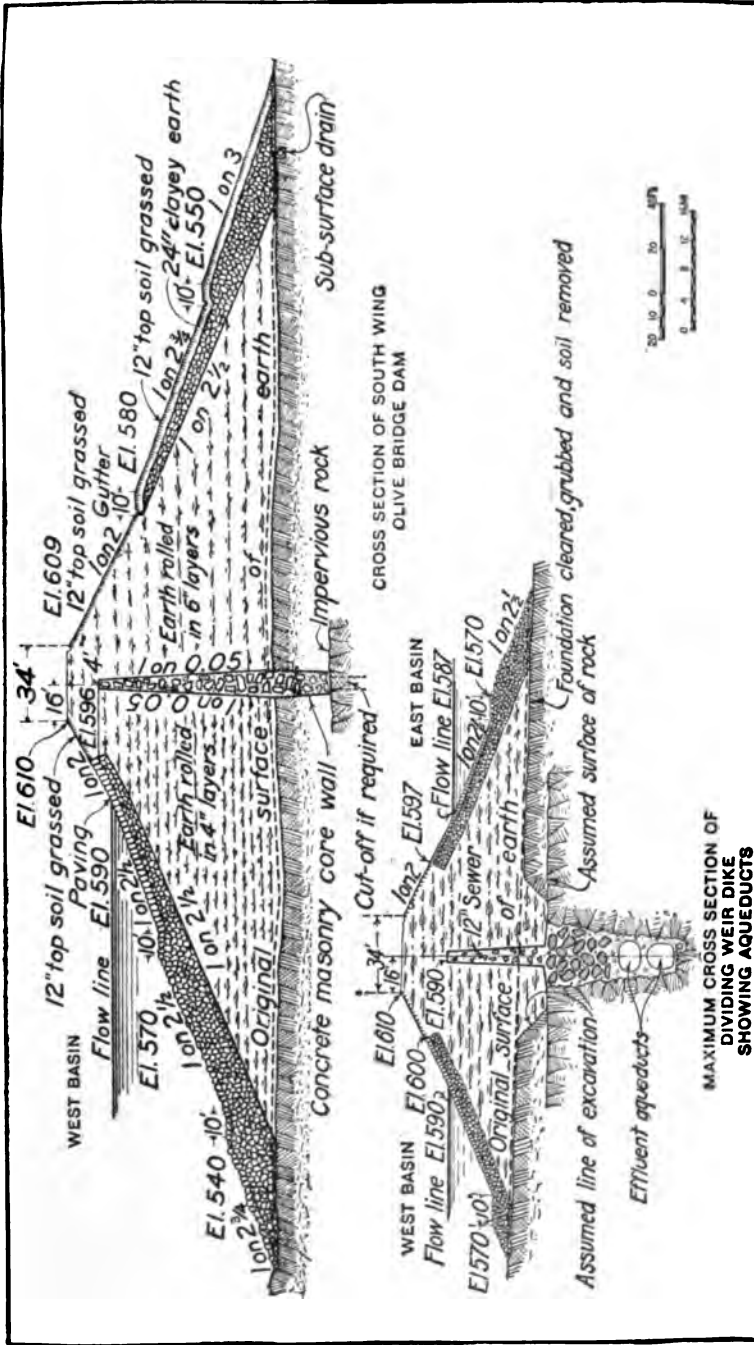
Ashokan Reservoir. Typical cross-section of earth embankment and Dividing Weir Dike over Pressure Aqueduct.
